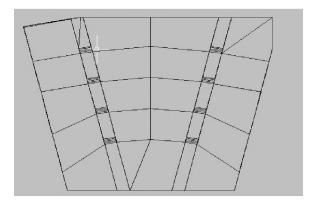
Plan view of Lecture Hall Ceiling for the Simplified Model
